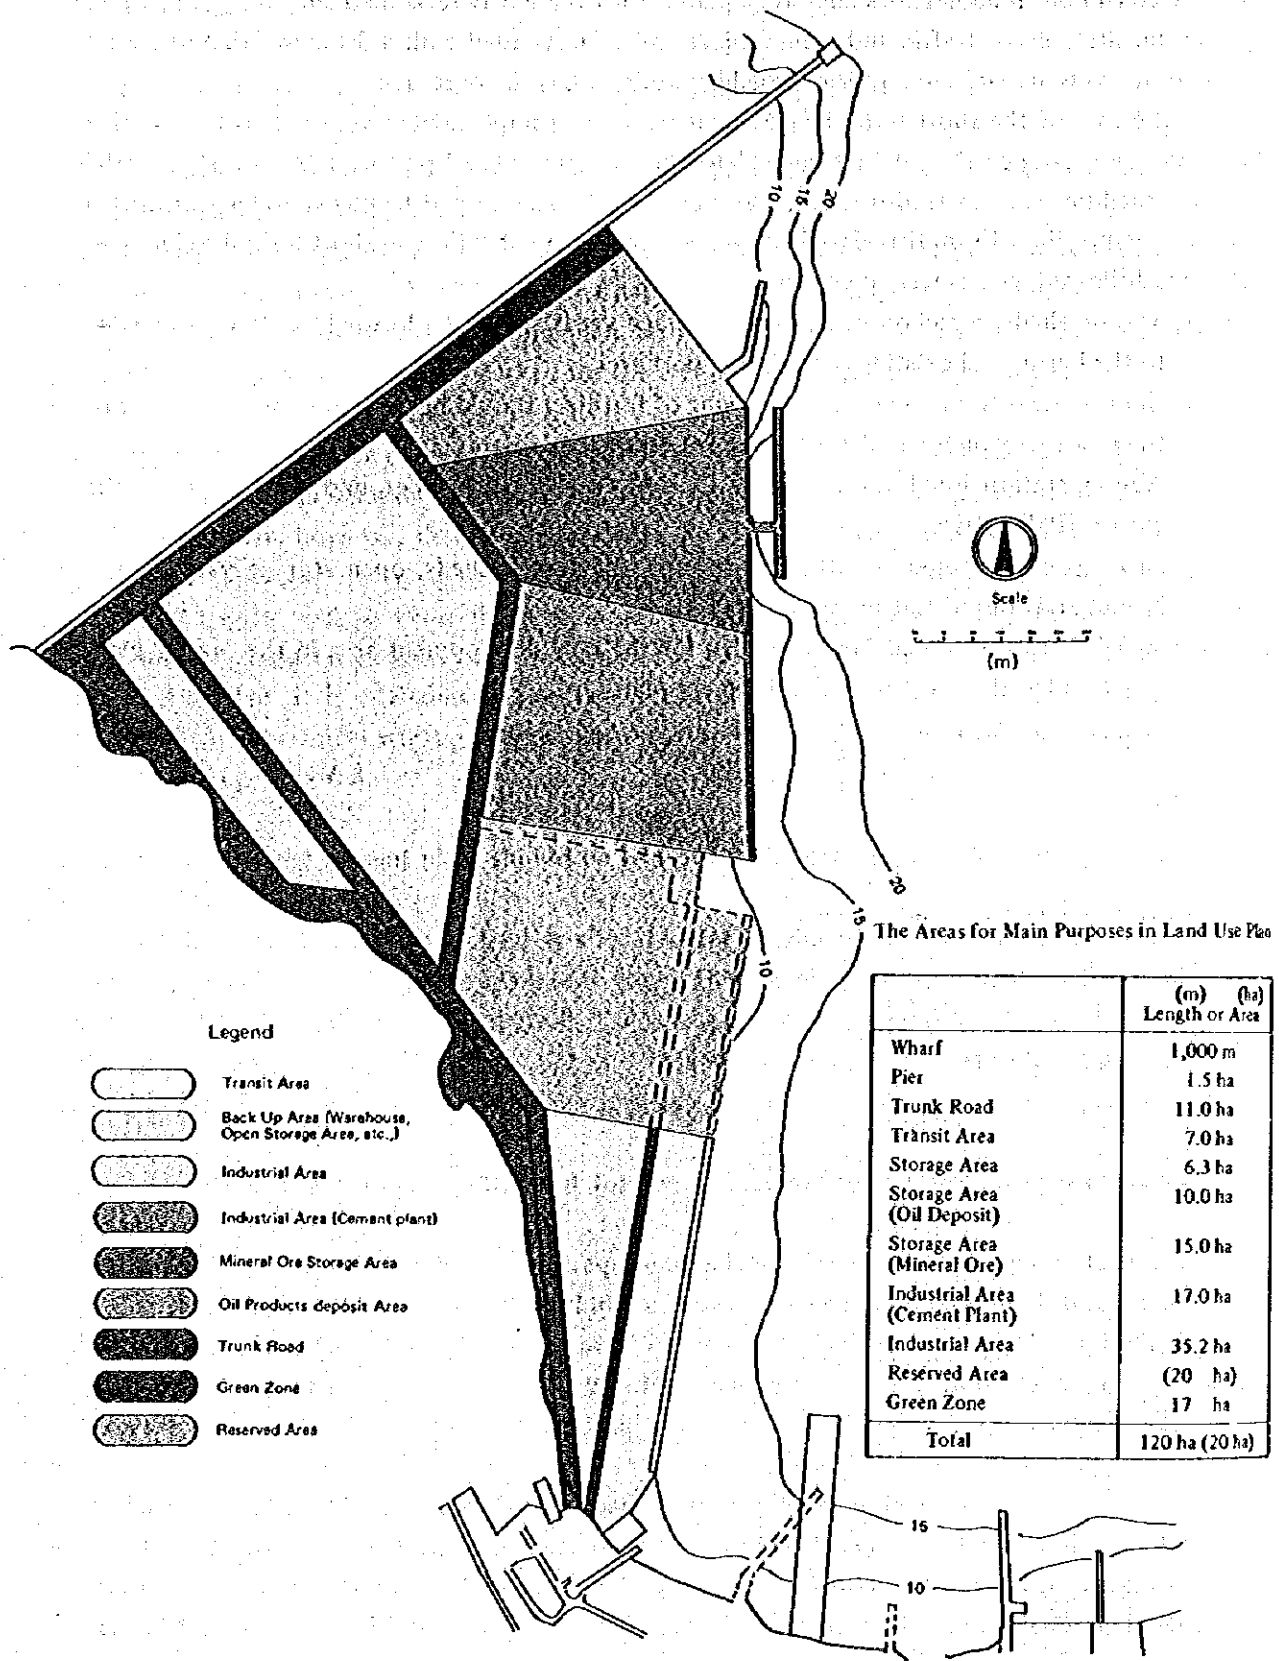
Land Use Plan for New Development Area in Master Plan
